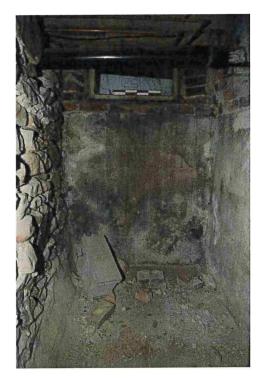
Rubble foundation of the house (left) and concrete and brick foundation of the extension as seen from the basement (December 2016).
